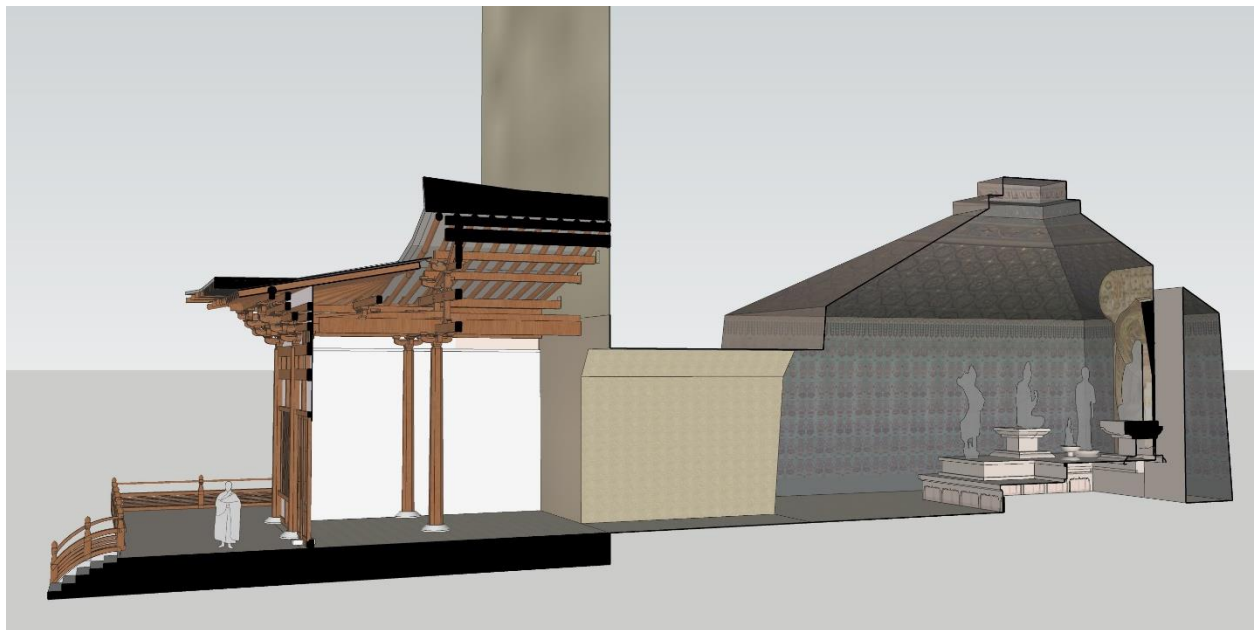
Sectional perspective of Cave 94 with the late-medieval ante-hall as reconstructed by author. Drawing by author.
